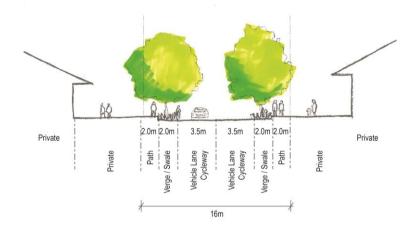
Growth Areas – typical road cross sections: Local Roads (minimising road corridor width where possible)
